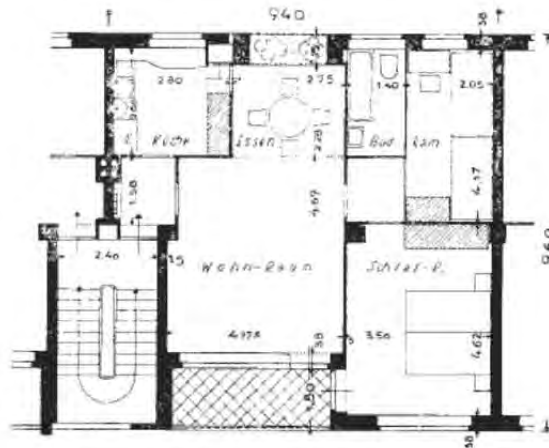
Floor plan of a small apartment in the Siemensstadt settlement Berlin, designed by Hans Scharoun – Ref: Karel Teige. The minimum dwelling
